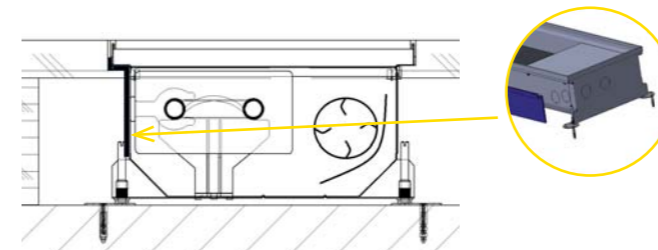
Hollow floor - thermal insulation for floor convector with fan to protect the floor on the exchanger side .
